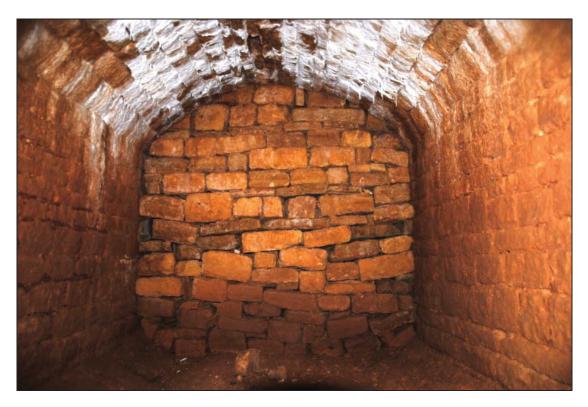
The 'bridge' under the Broadwalk at Area 1, looking south-west
